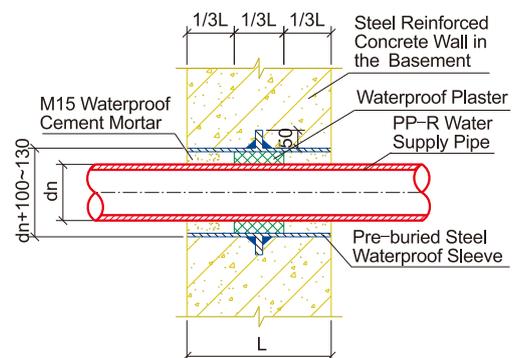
Pipe Crosses Steel Reinforced Concrete and Brick Wall Unit: mm
